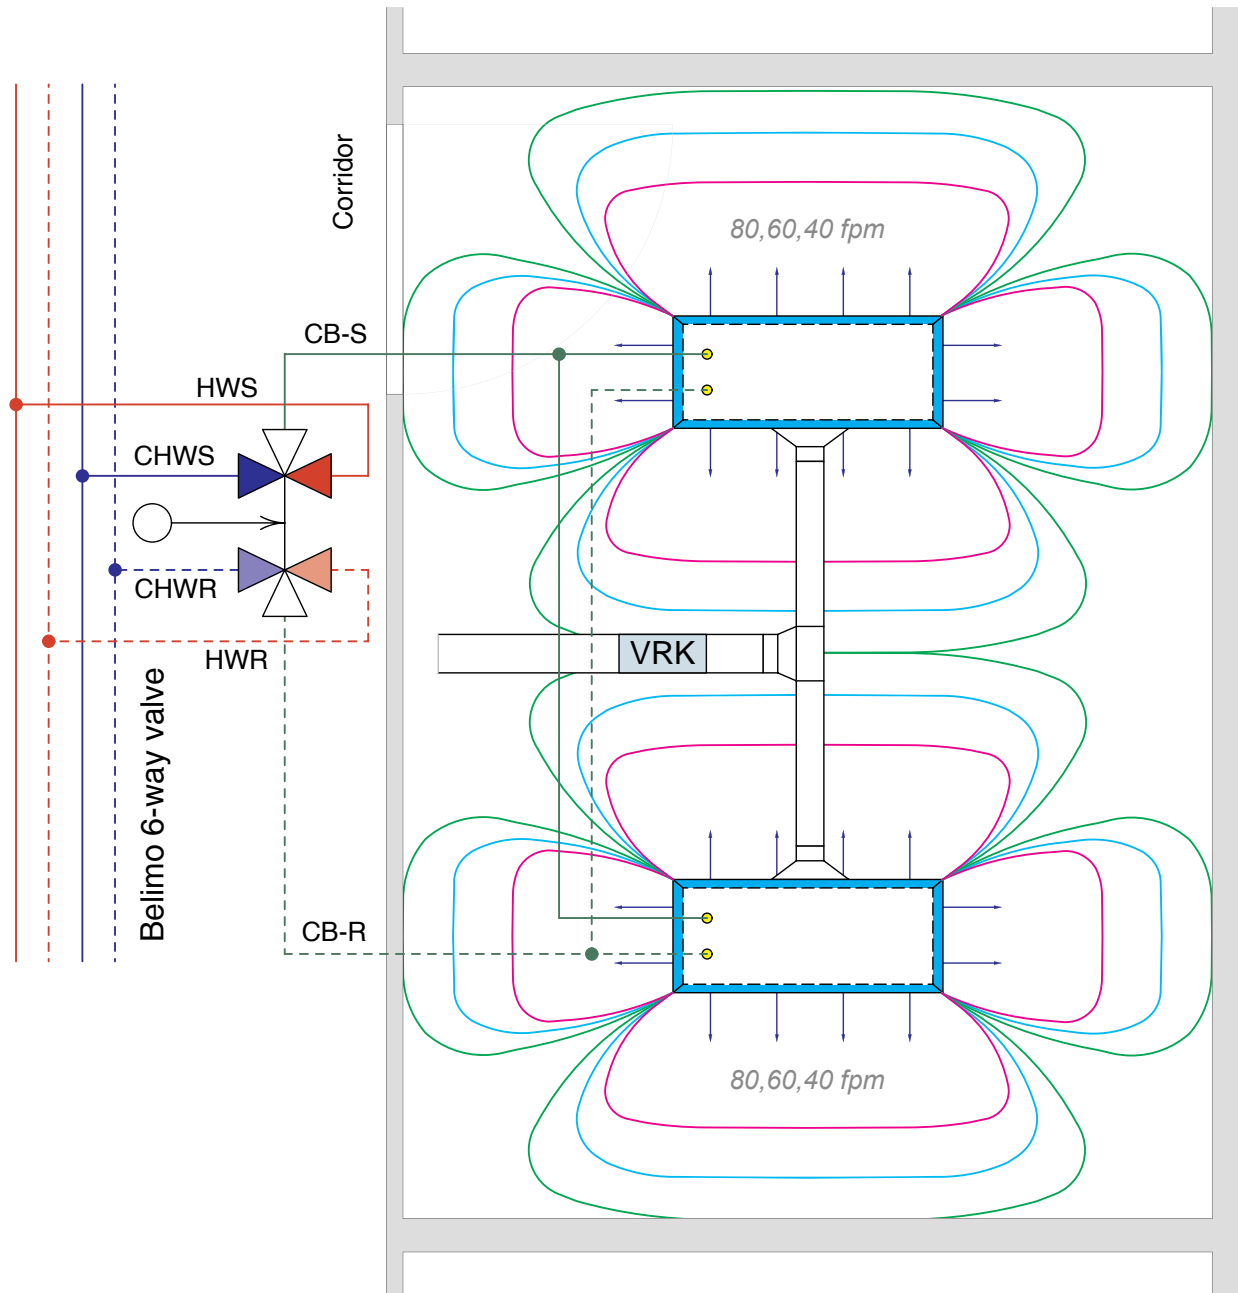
Chilled beam 4-pipe solution with 2-pipe beams !
